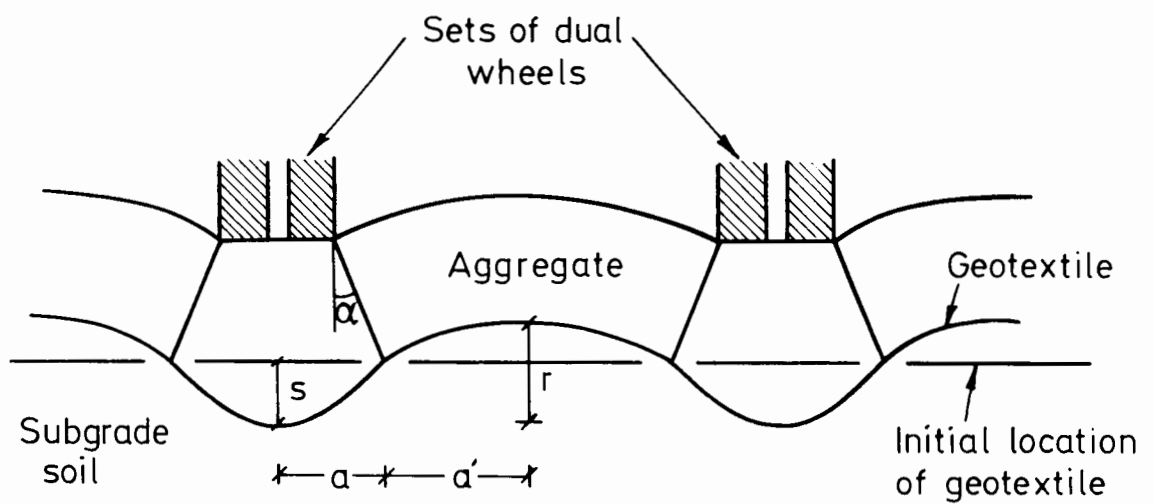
Shape of deformed geotextile (after Giroud and Noiray, 1981)
